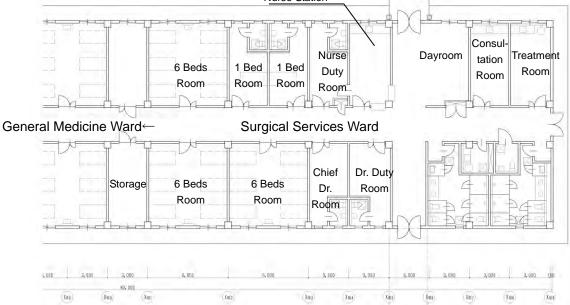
General Medicine & Surgery Ward Building Plan Scale: 1/200
